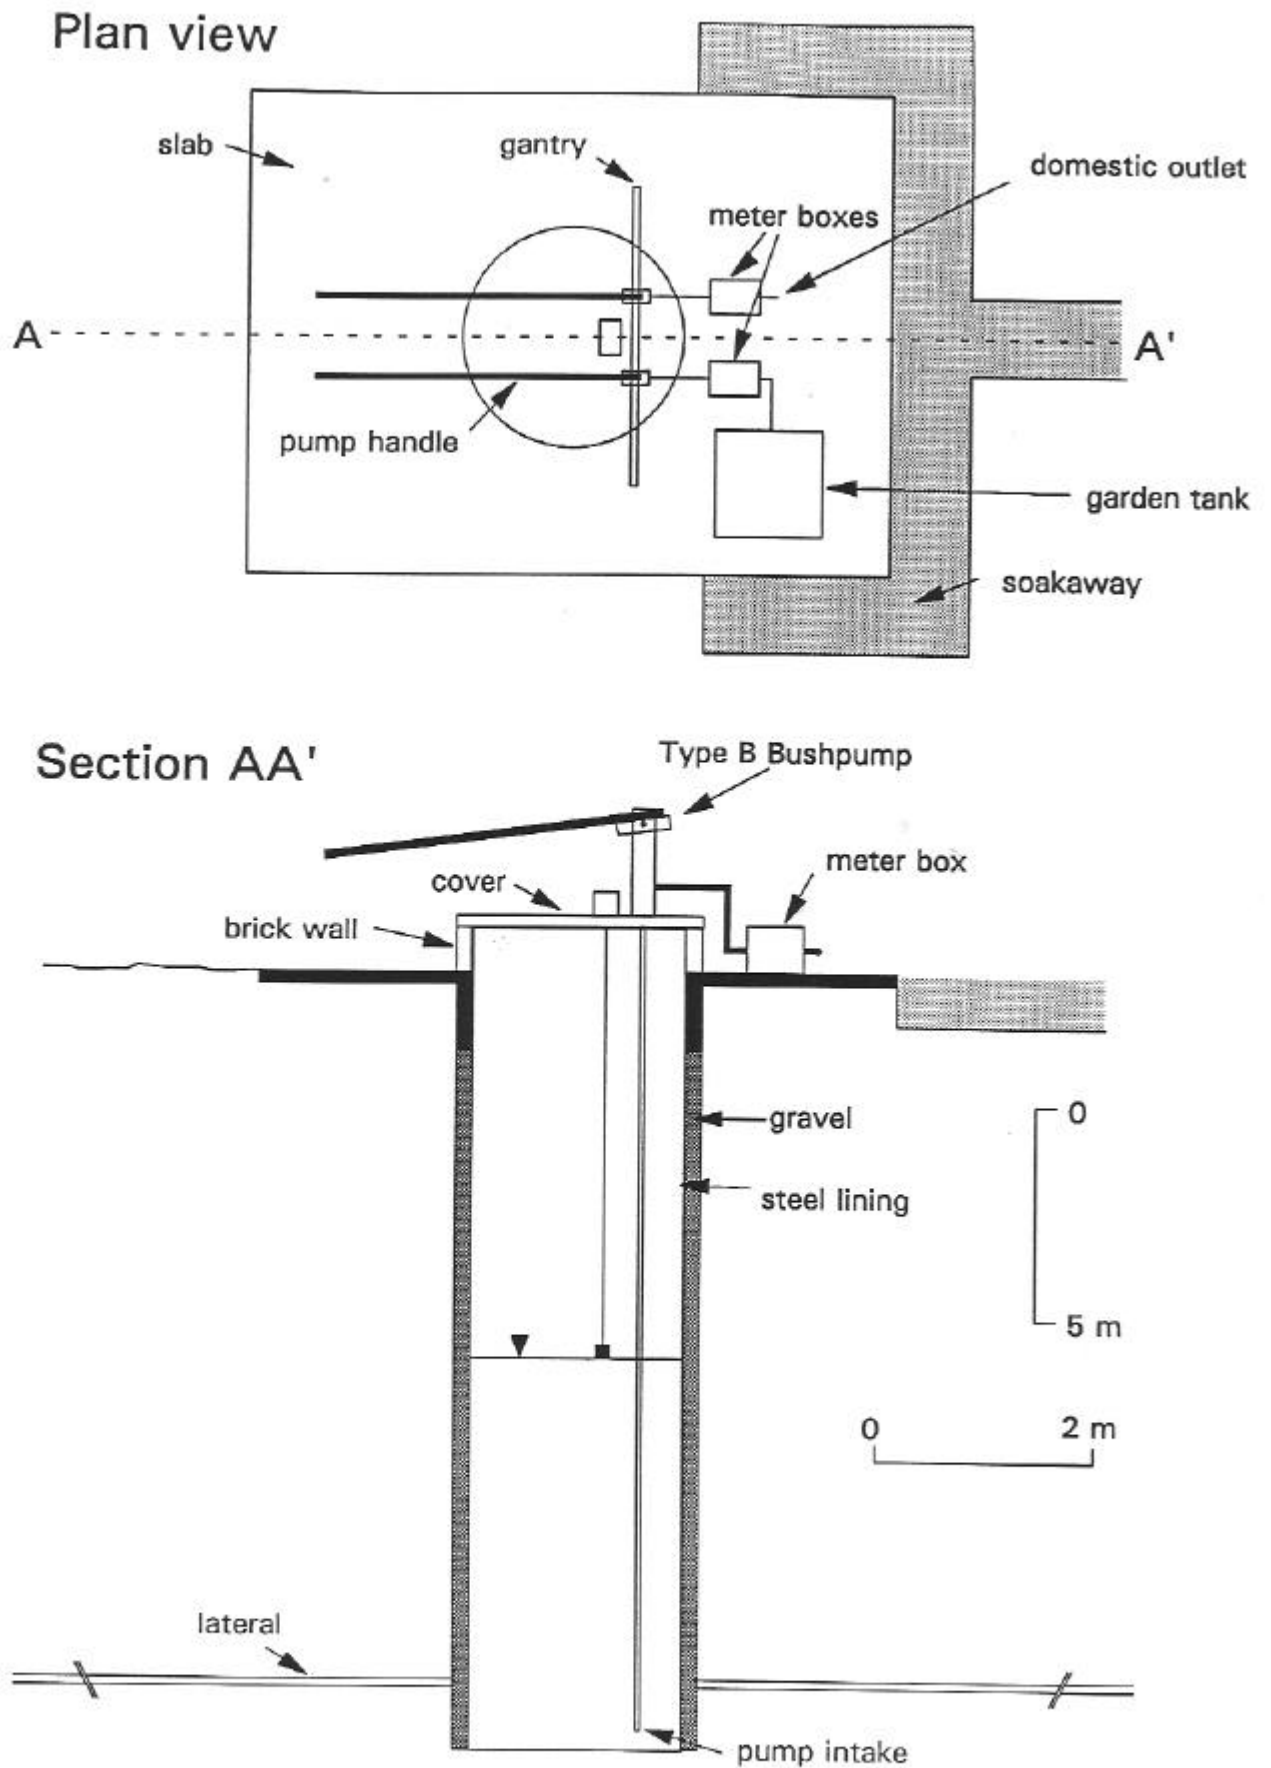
Collector well and headworks construction, site 8, Masekesa
